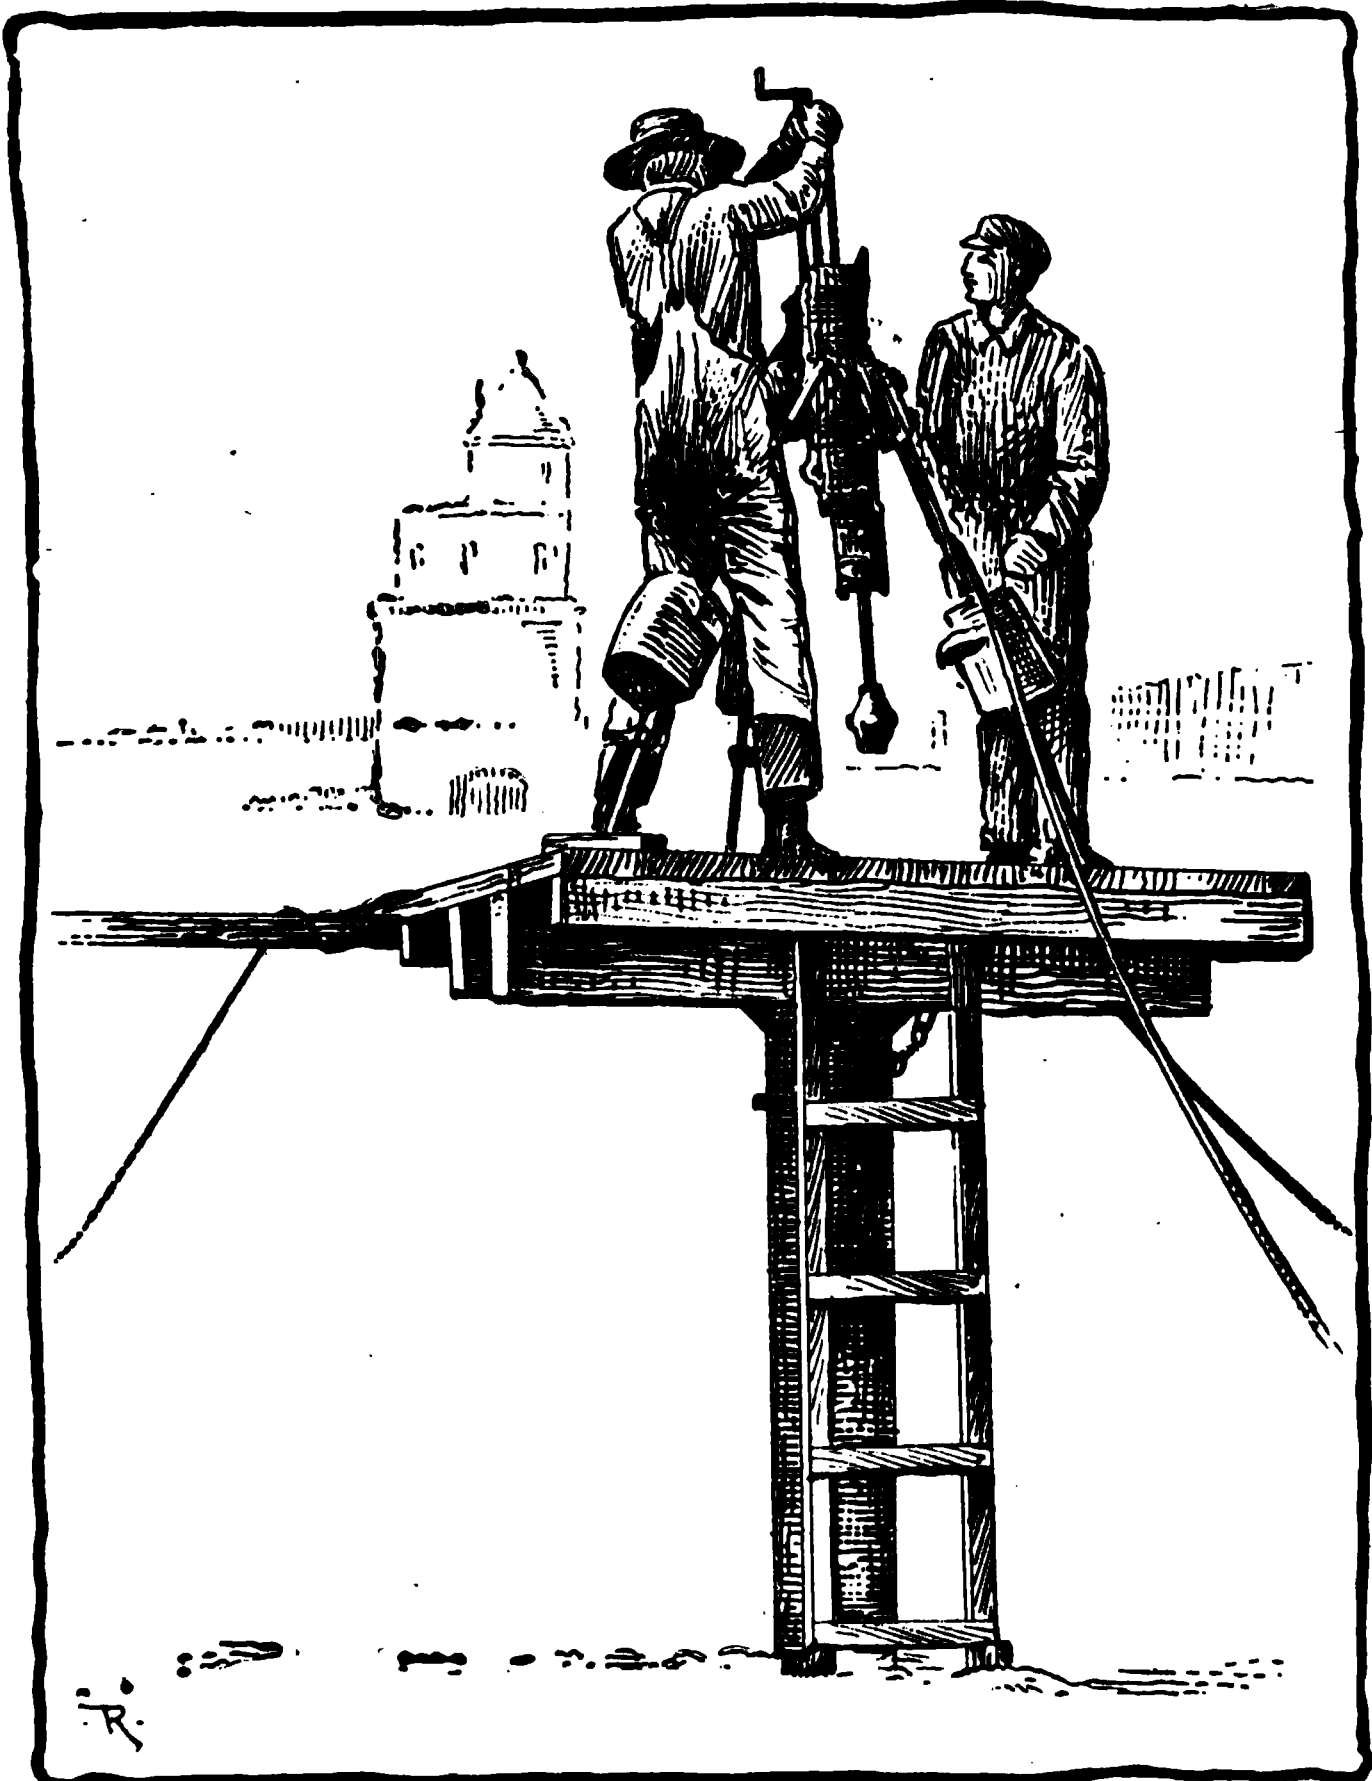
View of Portable Drill Platform with Drill Mounted and Ready for Operation.
